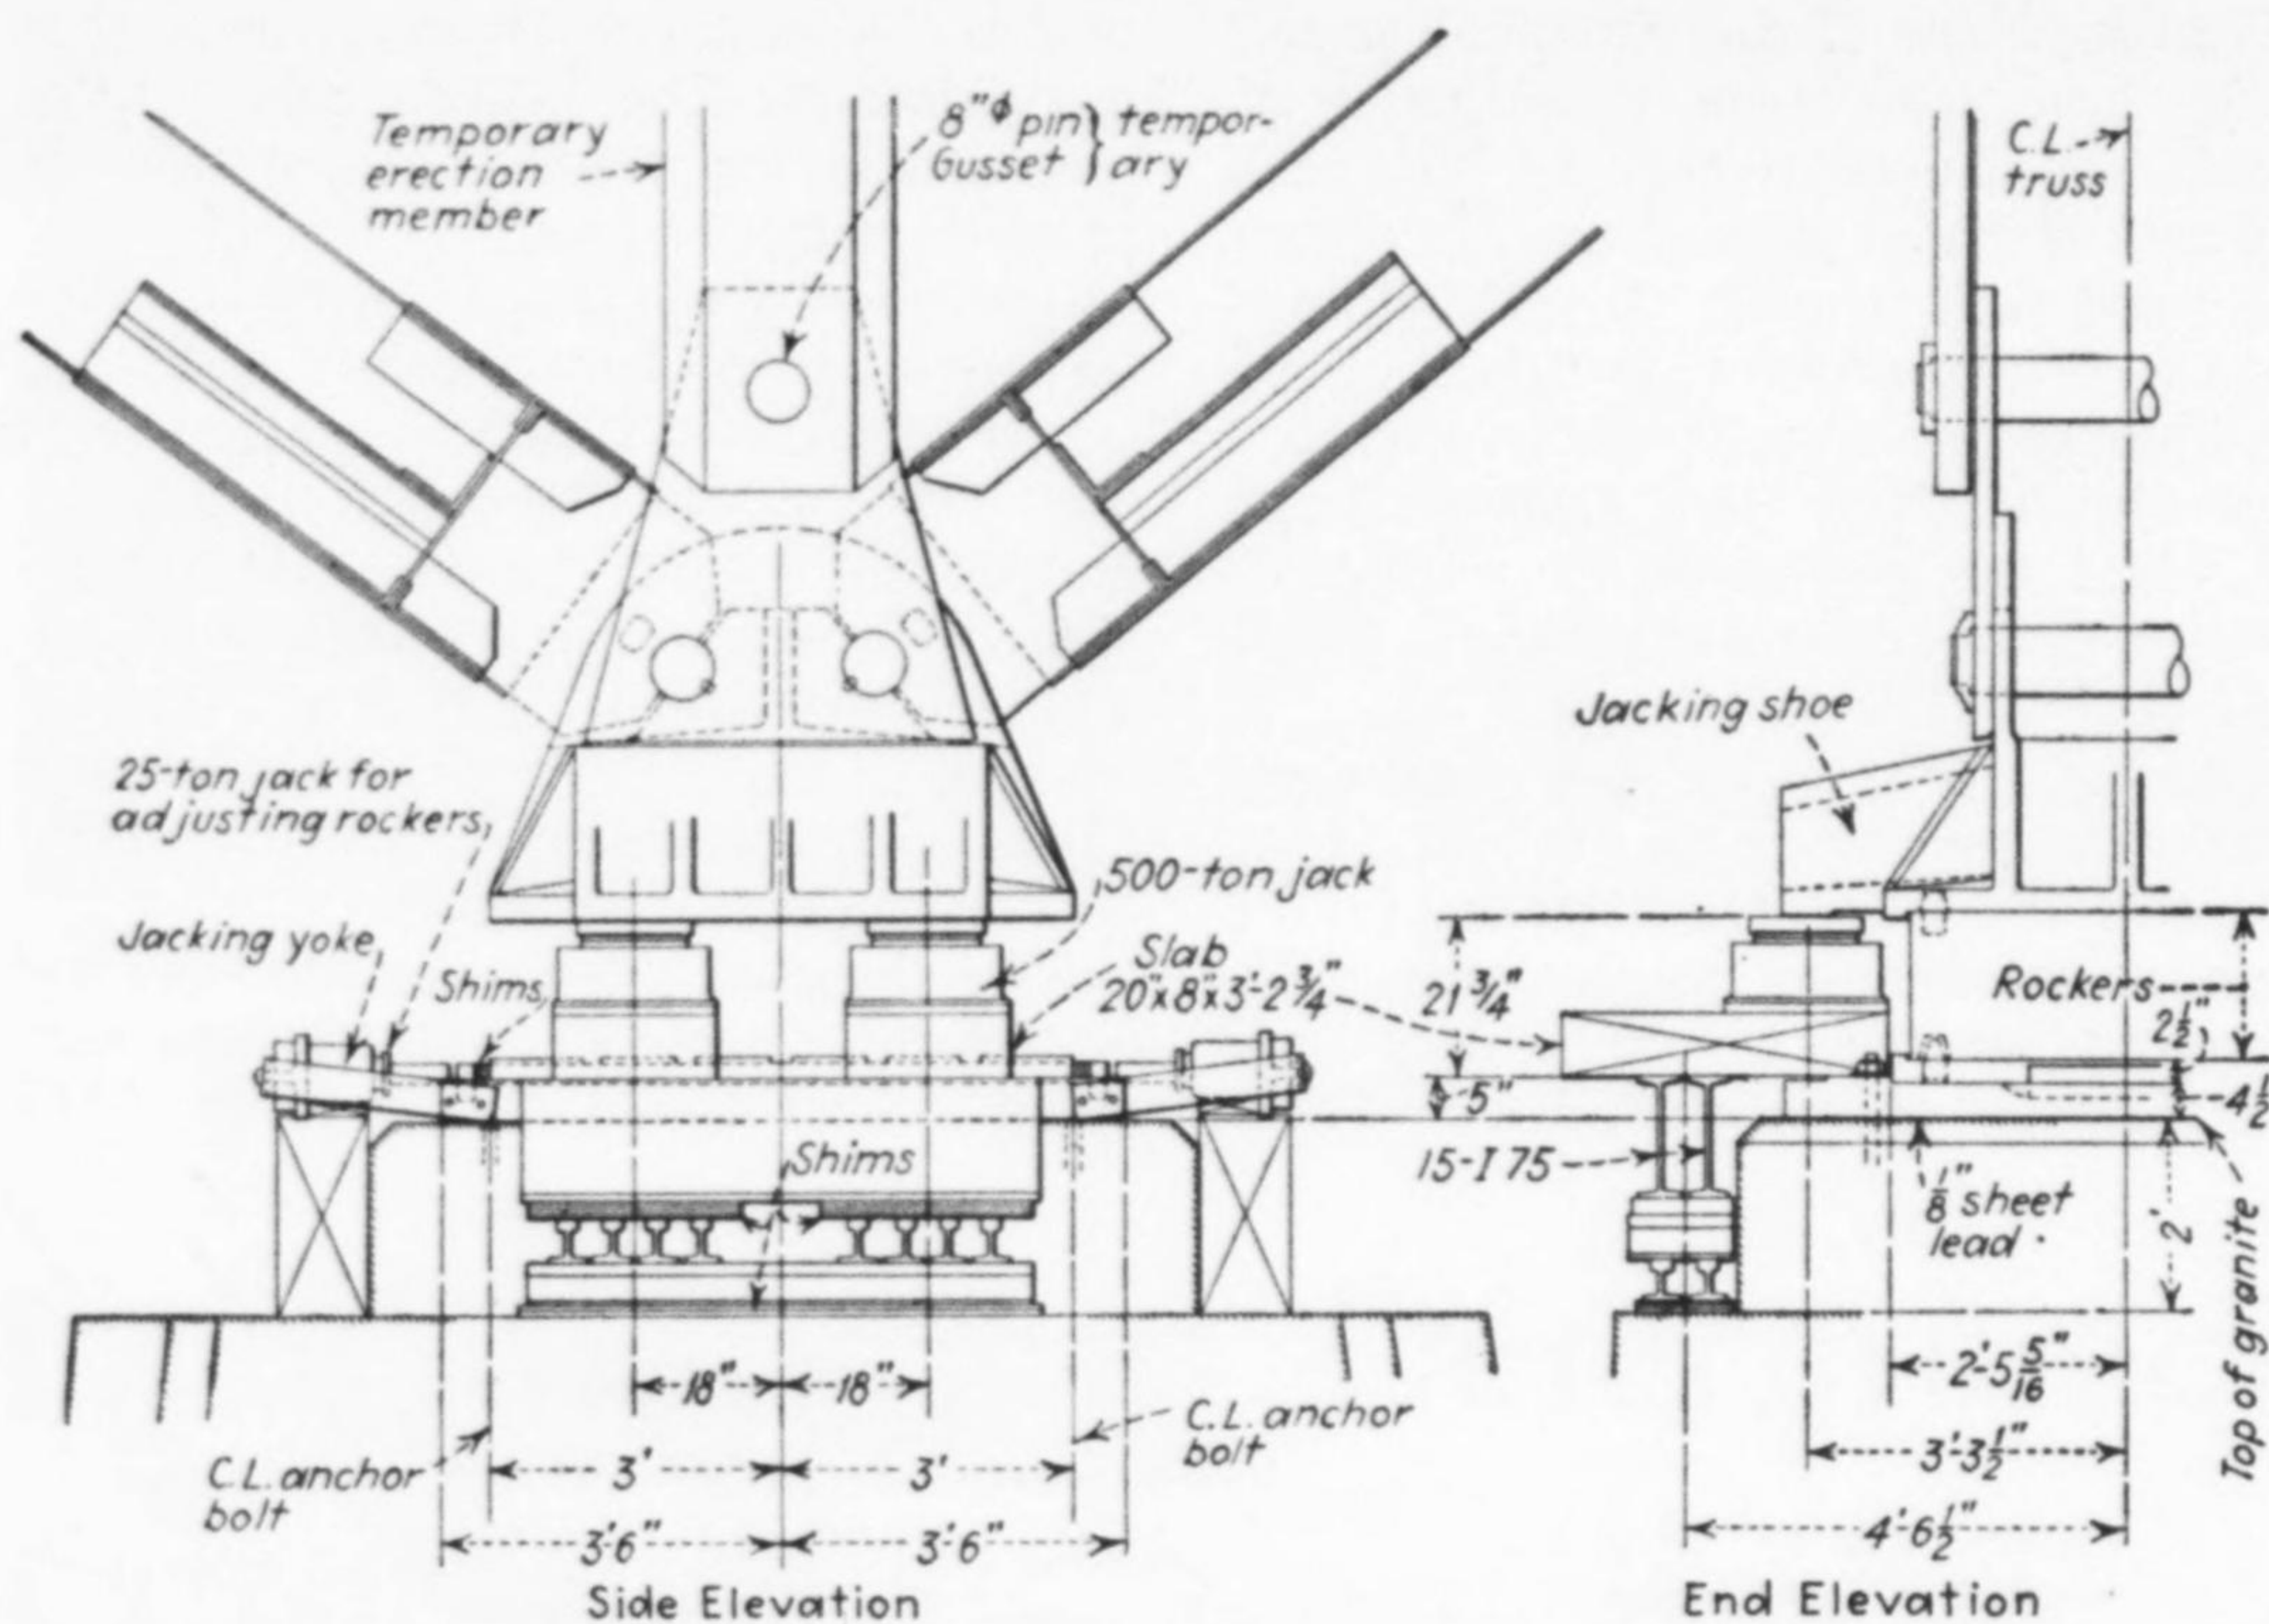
JACKING details required at expansion shoes on piers 15 and 17 during erection.
